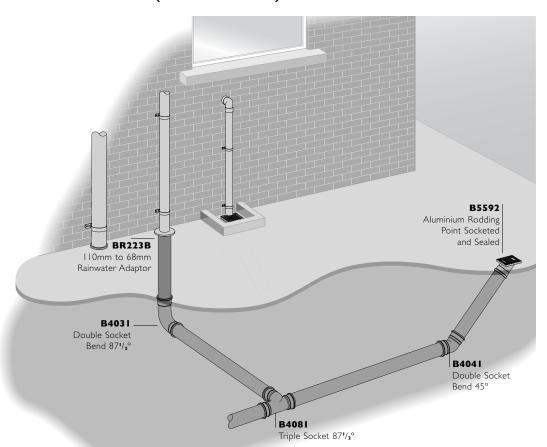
TYPICAL INSTALLATION (ENGLAND & WALES) - SURFACE WATER SYSTEM ONLY
